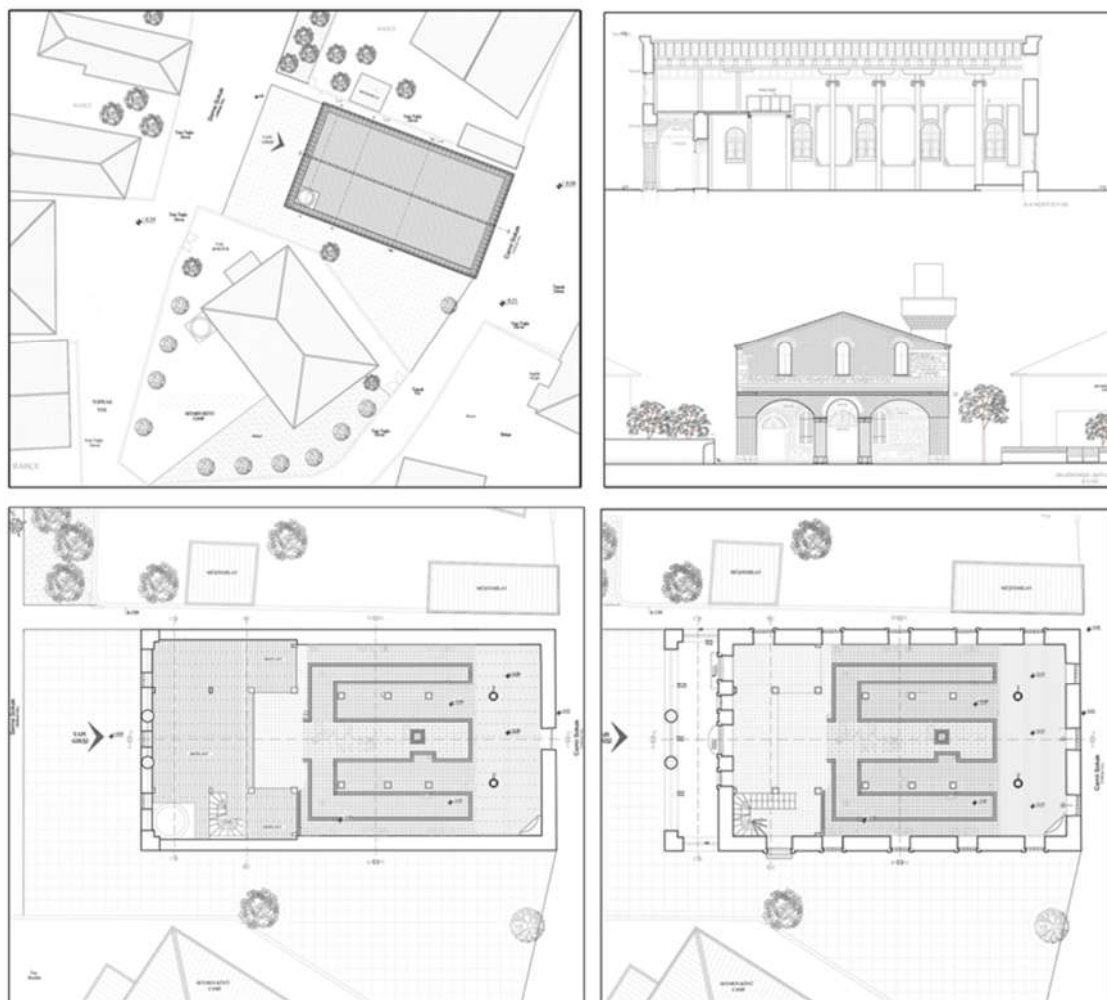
(top) Conservation proposals for the site plan, silhouette, ground floor, and mahfil floor plans; (bottom) Reuse proposals for ground floor and mahfil floor plans (drawing scale: 1/100) (authors' archive).
